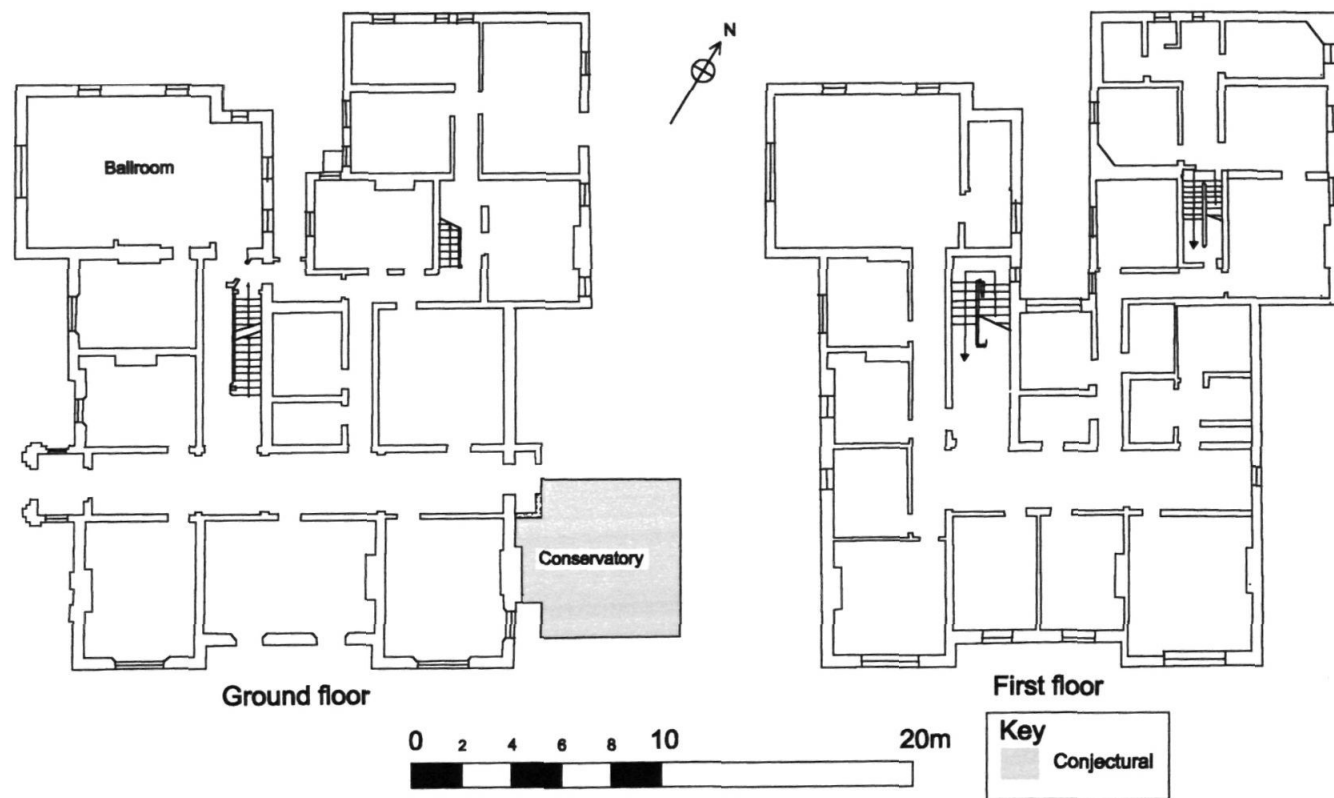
Plan of ground and first floor of Northlands House as it probably was in 1896 after northern additions of the ballroom and extension of the servants' wing.
